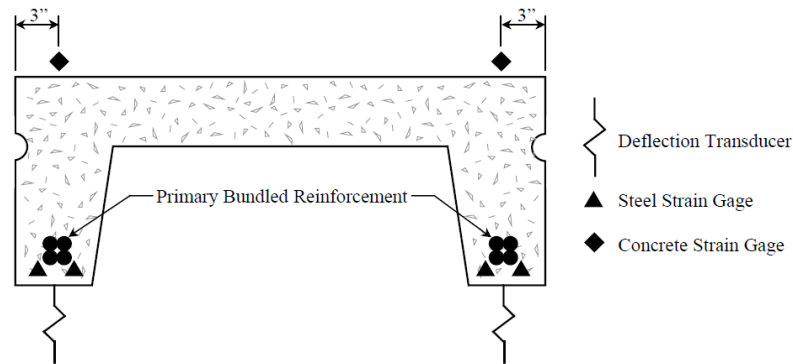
Cedar Girder Cross Section and Instrumentation (Klaiber, et al 2001)
